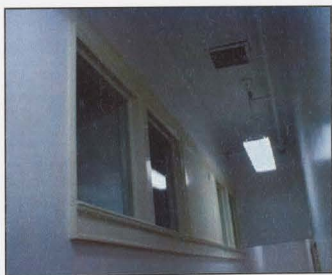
WINDOW BANK IN PARTITION WALL ON 3RD FLOOR
